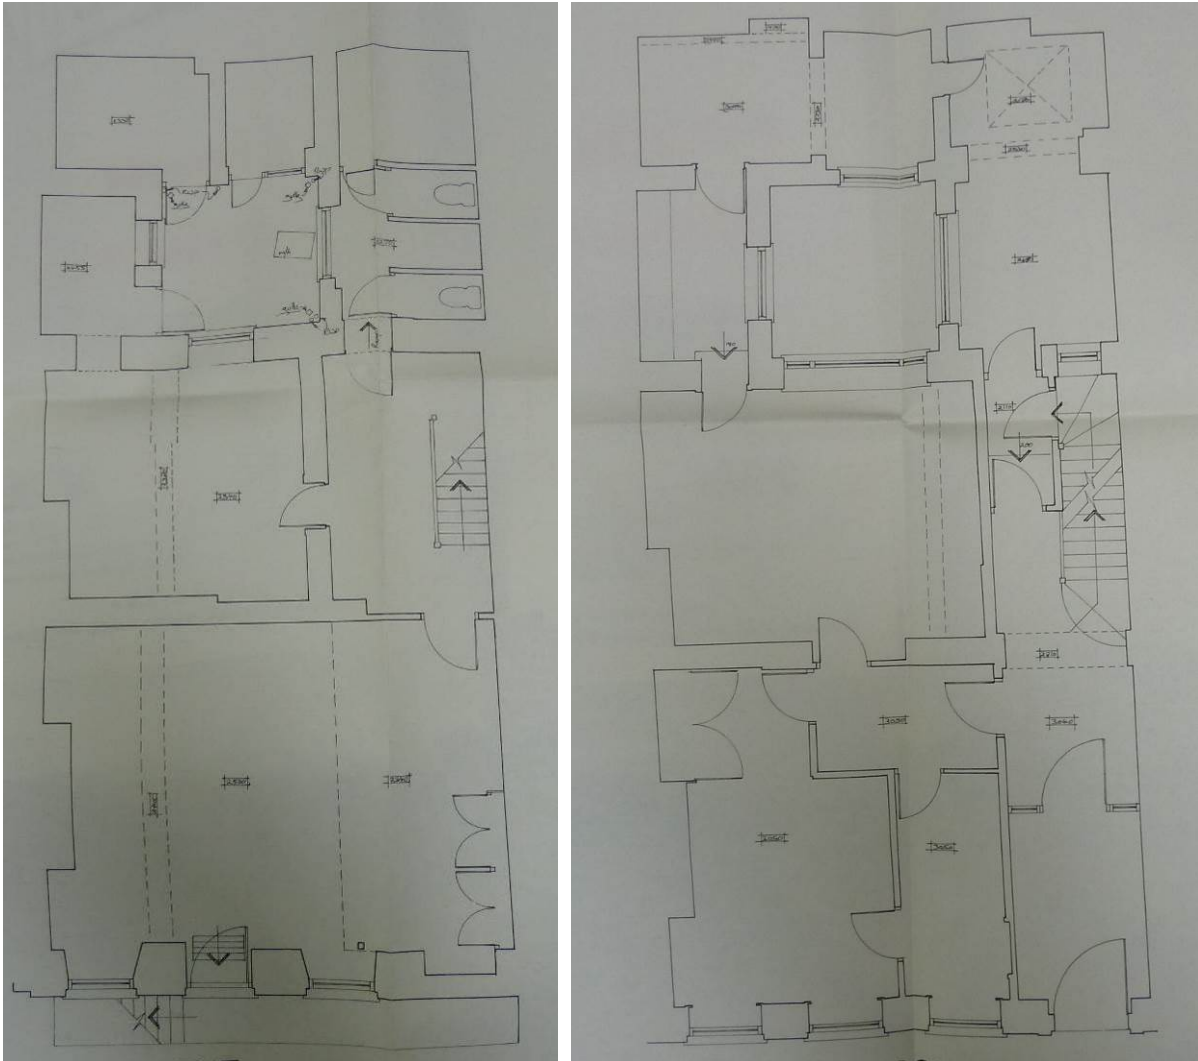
Basement (left) and ground floor plans as existing in 1990, Gerald Steer (LB Camden, planning file)
